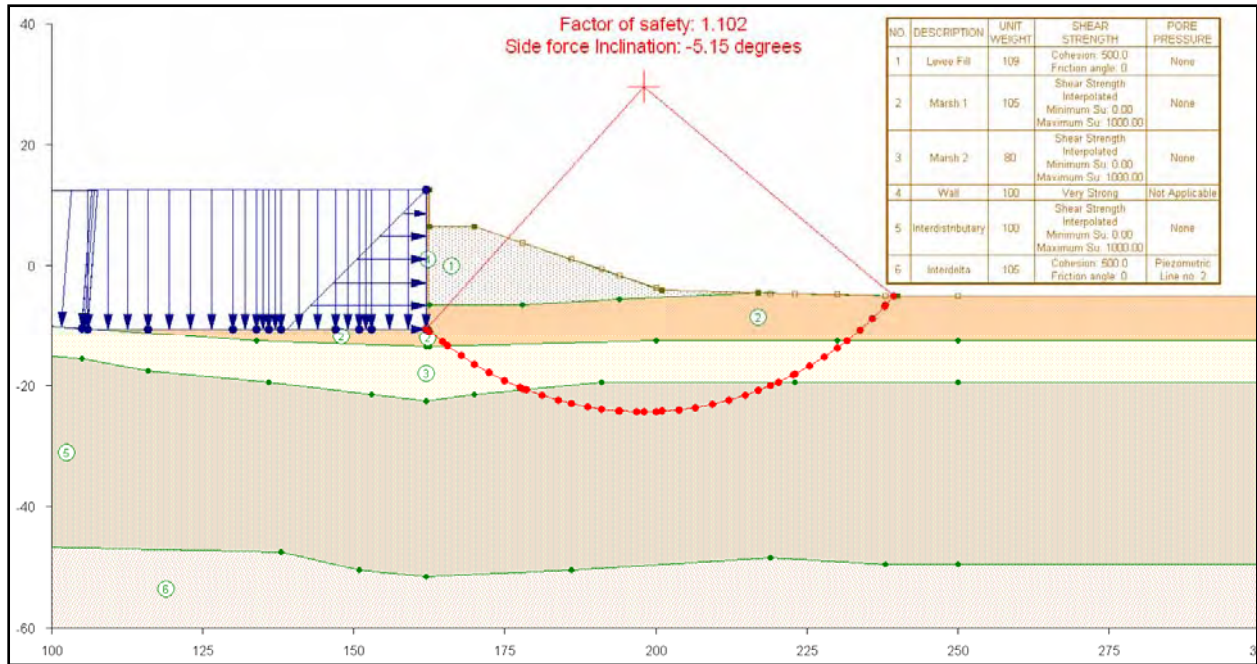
IHNC – East Bank (South Breach), Case 4, Canal Water Level = Top of Wall - 12.5 ft (NAVD 88), with Crack
